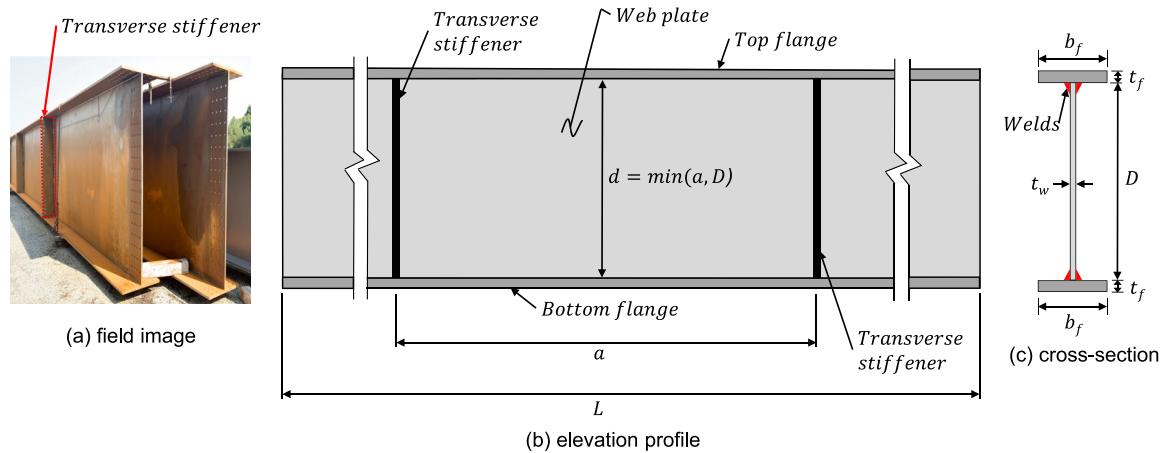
Illustration of a typical welded steel plate girder.
